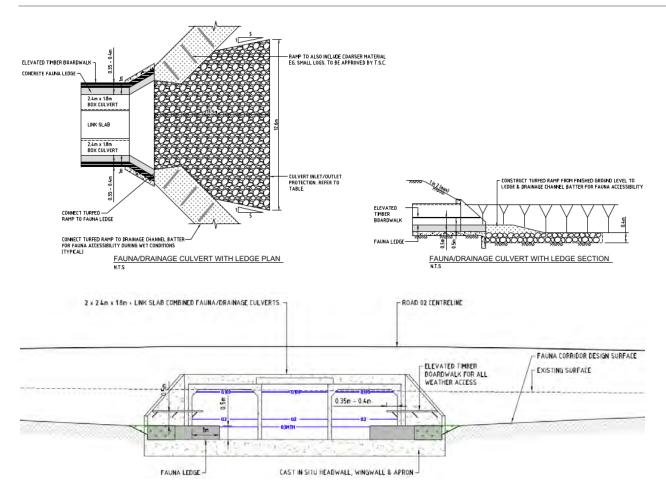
Plan, Section and Elevation of the proposed box culverts, link slab and fauna ledges, with stormwater levels shown in blue
